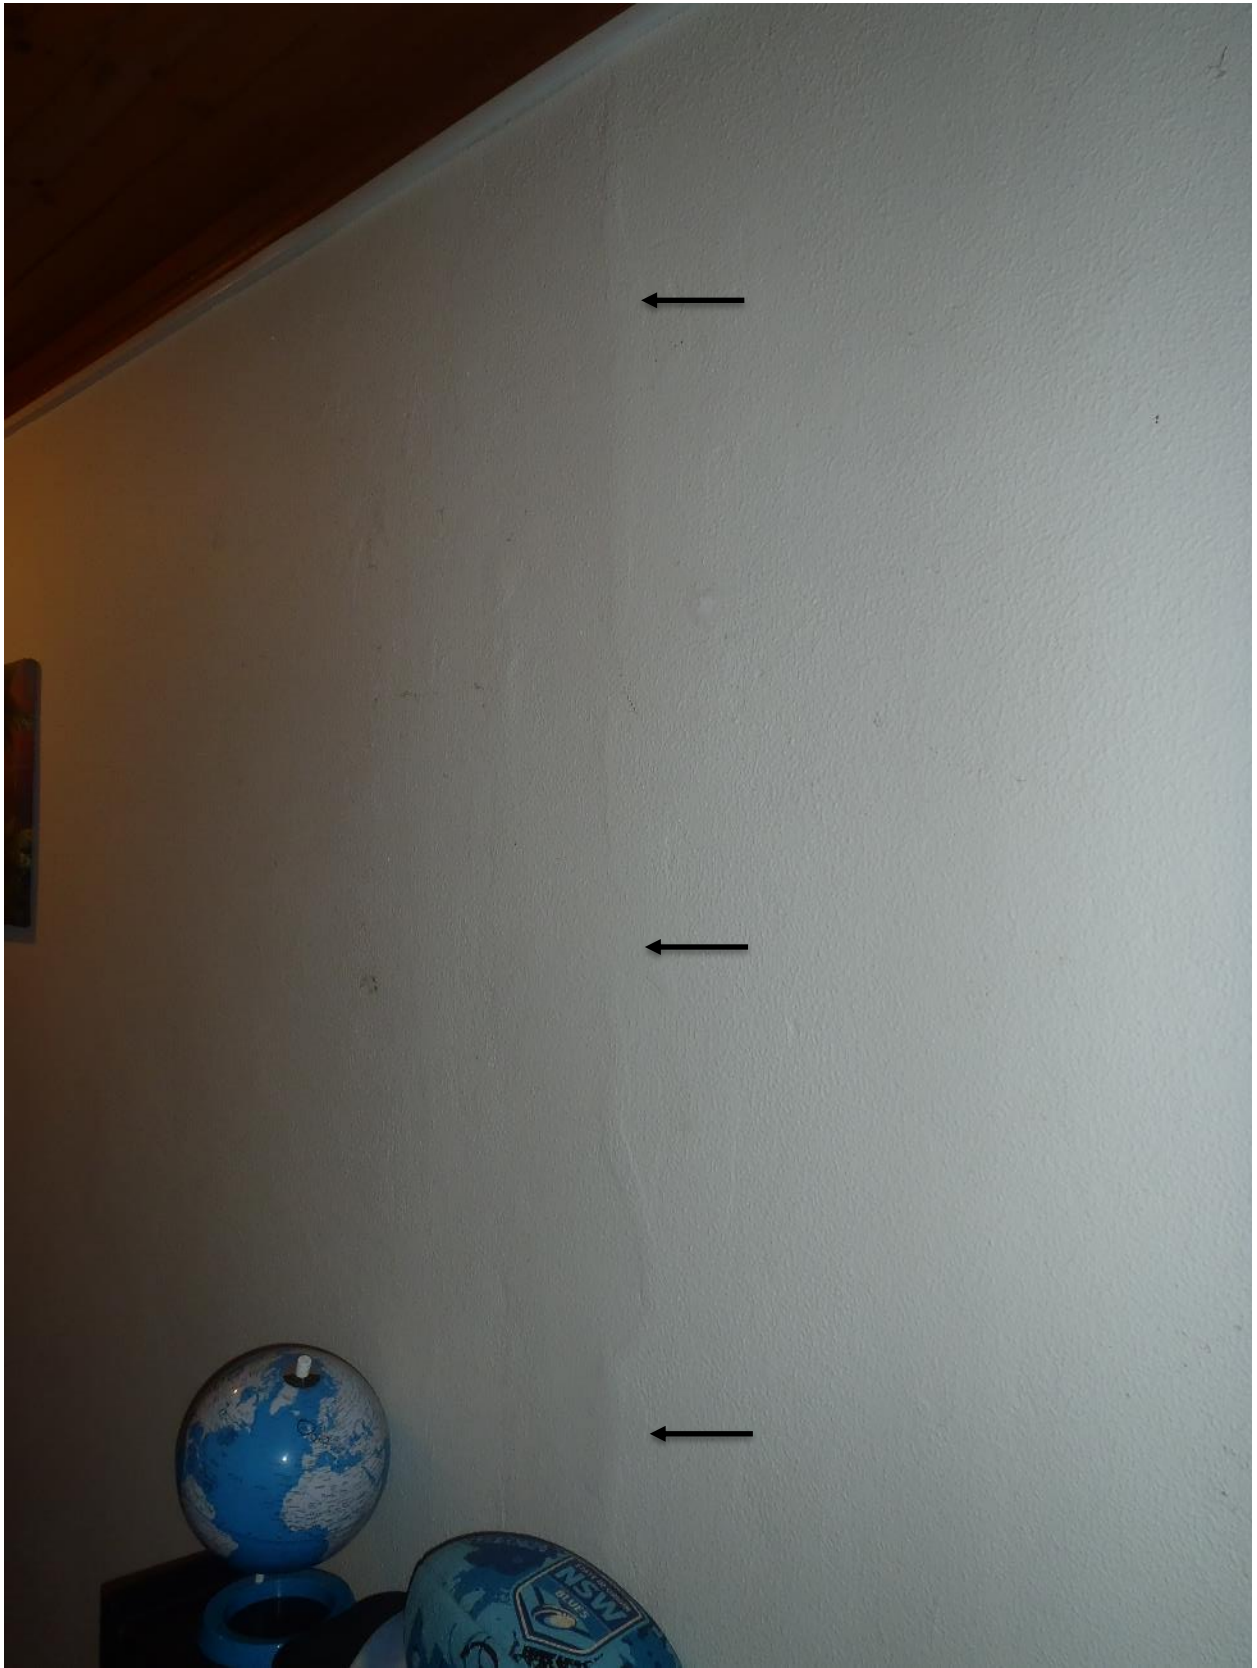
shows damage to the plasterboard wall lining on the western external wall of the lower ground floor Bedroom 1.
